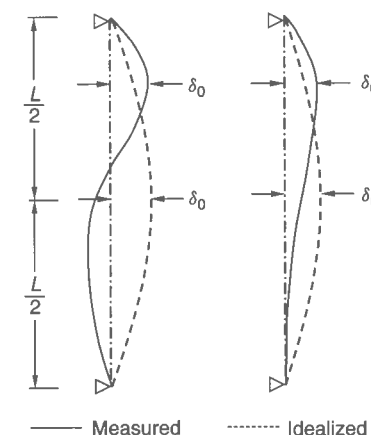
Idealization of initial deflection shapes for welded one-dimensional members
